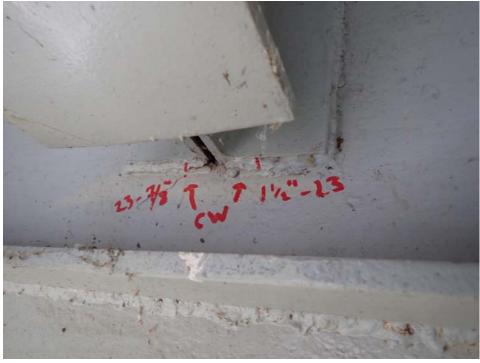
Looking east at the stringer 3 connection to floor beam 4, span 7. Note: one missing stringer connection bolt.
